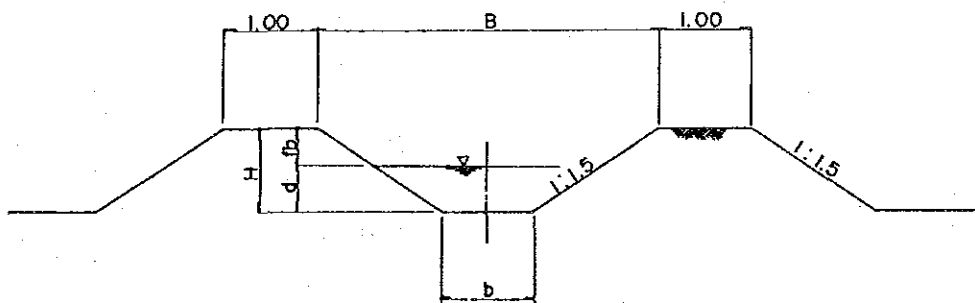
Typical Cross Section of Proposed Tertiary Canal
